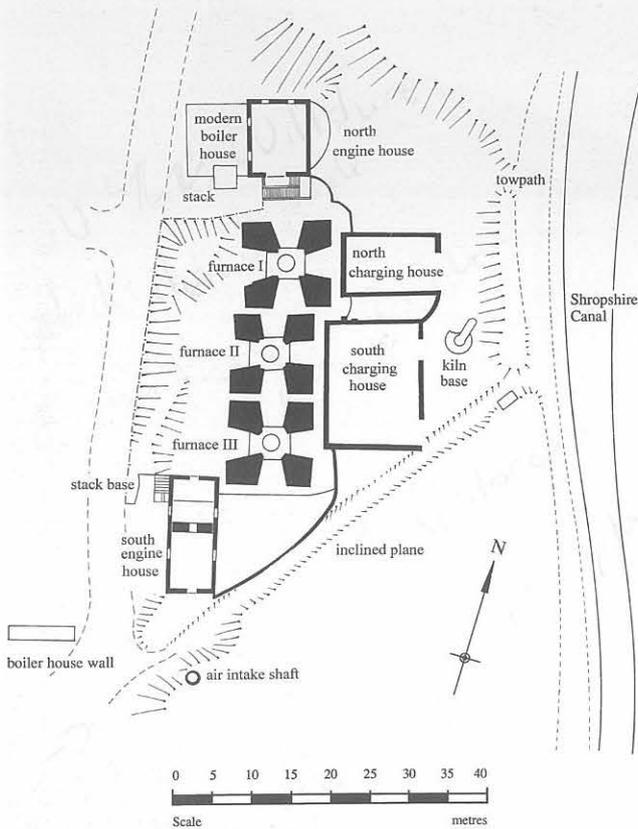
Blists Hill blast furnaces site plan. The charging houses and engine houses are all linked by retaining walls. West of the south engine house are vaulted chambers below ground and beneath the former boiler settings.
